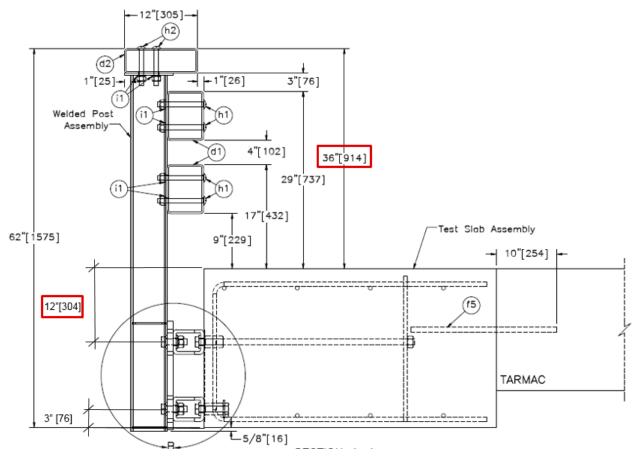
Surrogate Bridge Deck Profile View for MASH 2016 Test Designation Nos. 4-11 and 4-12
